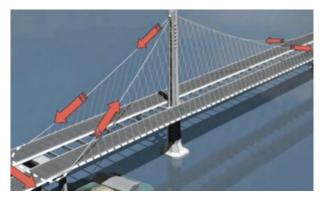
Diagram of load transfer on the Oakland Bay Bridge.
